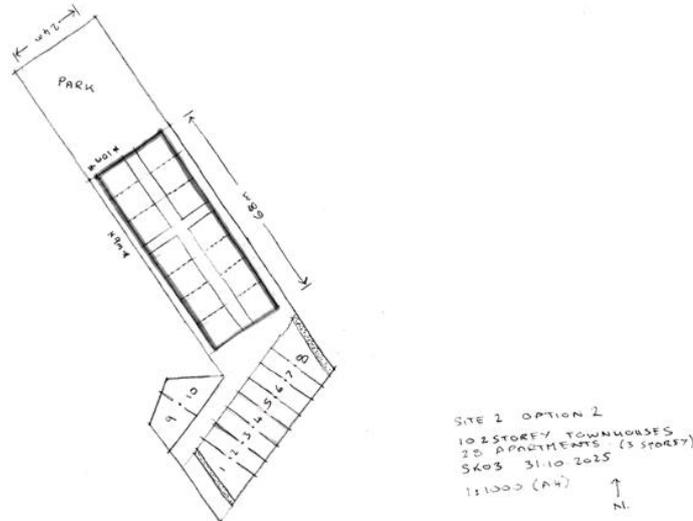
Site 2 - Kookora Street. Option 2 Townhouse and Apartment Configuration. Source: PSA Consulting.
